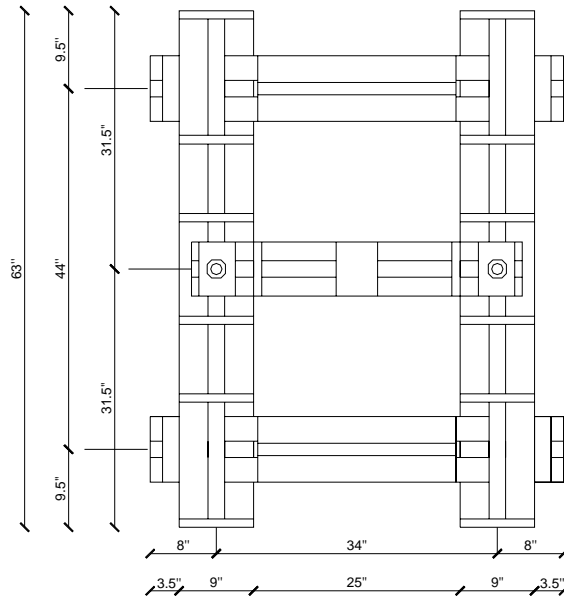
Steel Frame for wall testing-FRONT VIEW W(scale 1:20)
